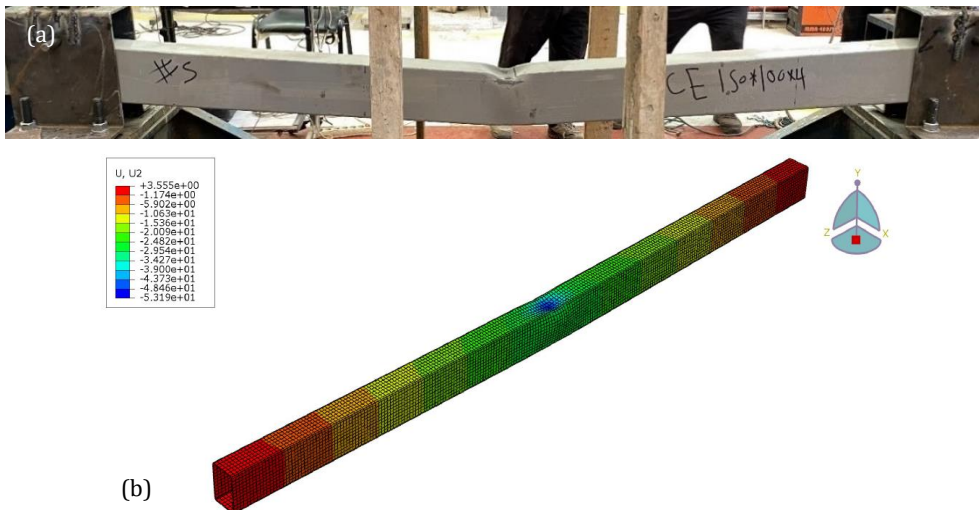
Deformed shape of 100X150X4 empty single-cell column (SCC-E):
